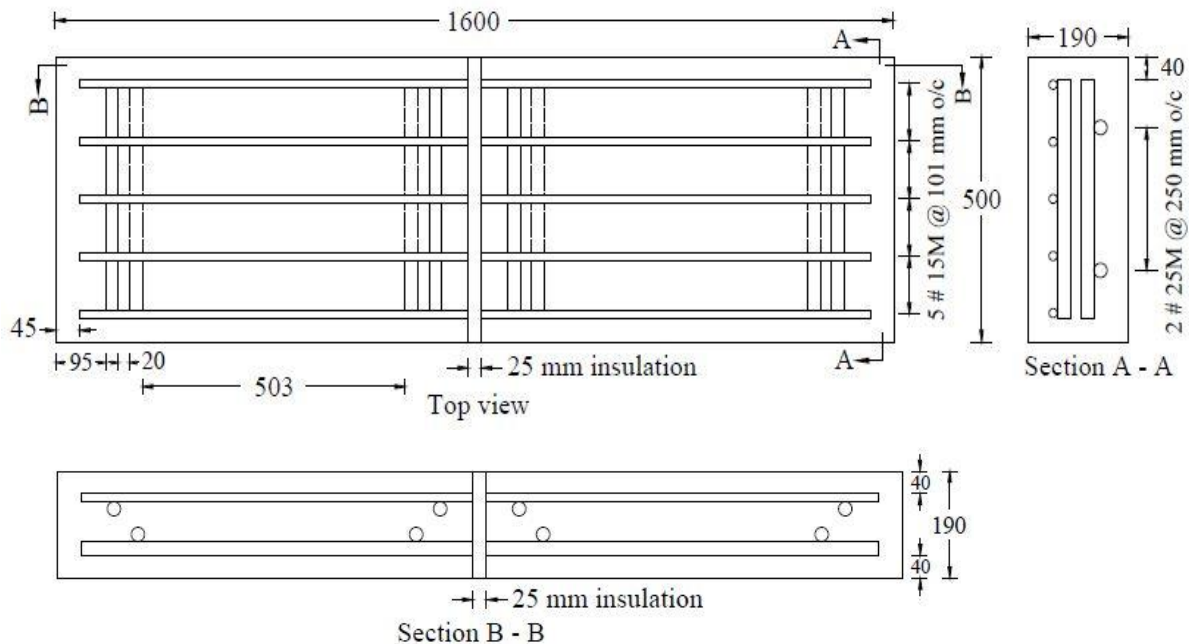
GFRP reinforced slab (all dimensions are in mm)
